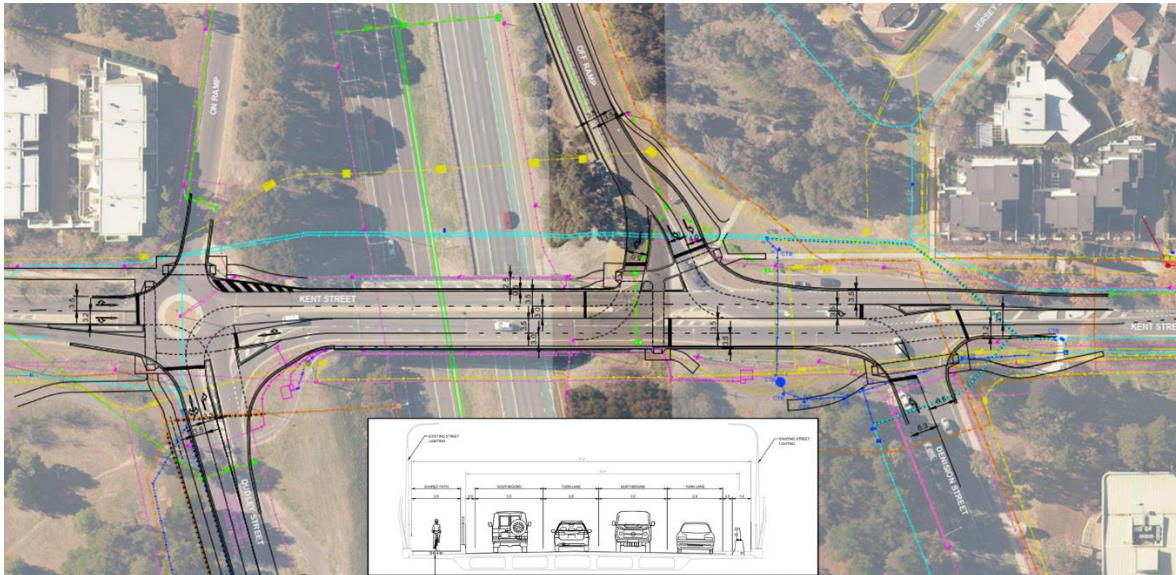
Preliminary concept plan for upgrade of Kent Street Intersections
